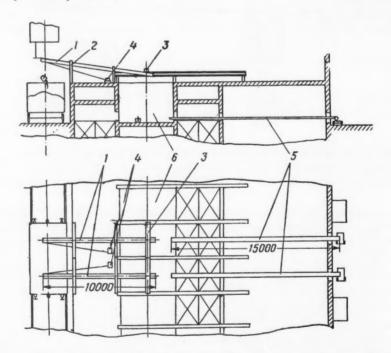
Diagram showing the installation of single-rope hoists: 1) jib; 2) U-shaped supports; 3) crossbar; 4) hoist winches; 5) narrow belt conveyors; 6) checkers.
